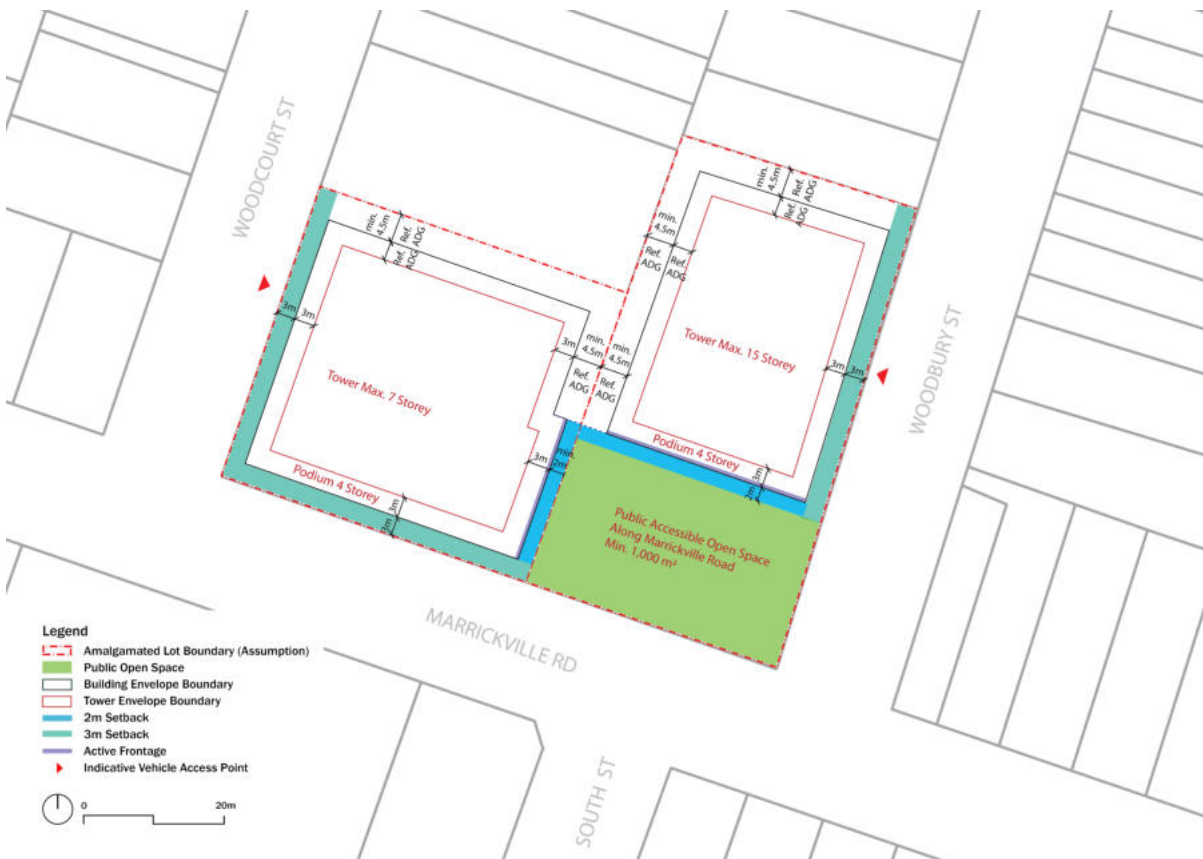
359–365 Marrickville Road West and 2–6 Woodbury Street Key Site Plan
